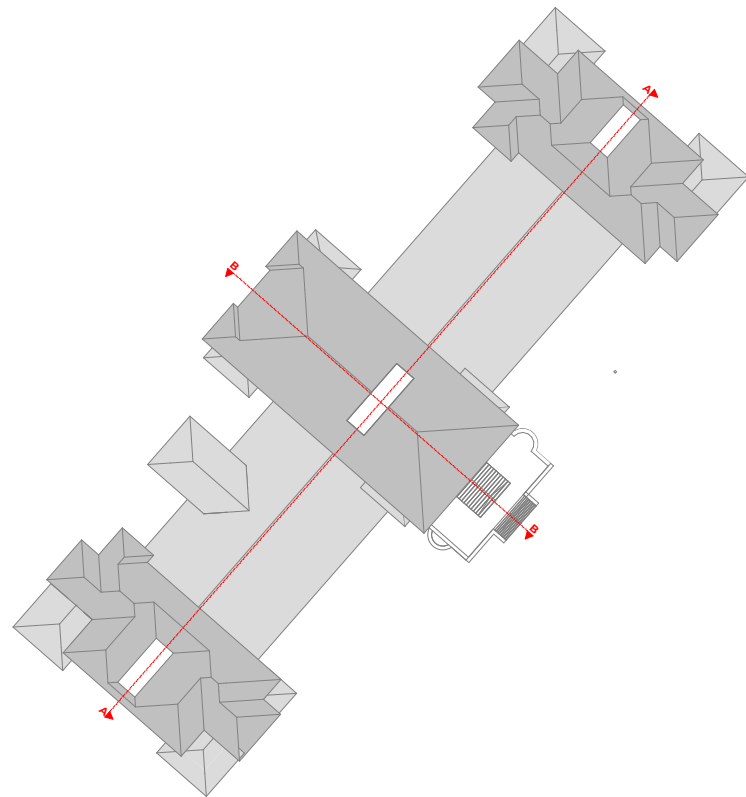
Roofplan Scale 1:1000 (Source: Created by the author, 2024)
